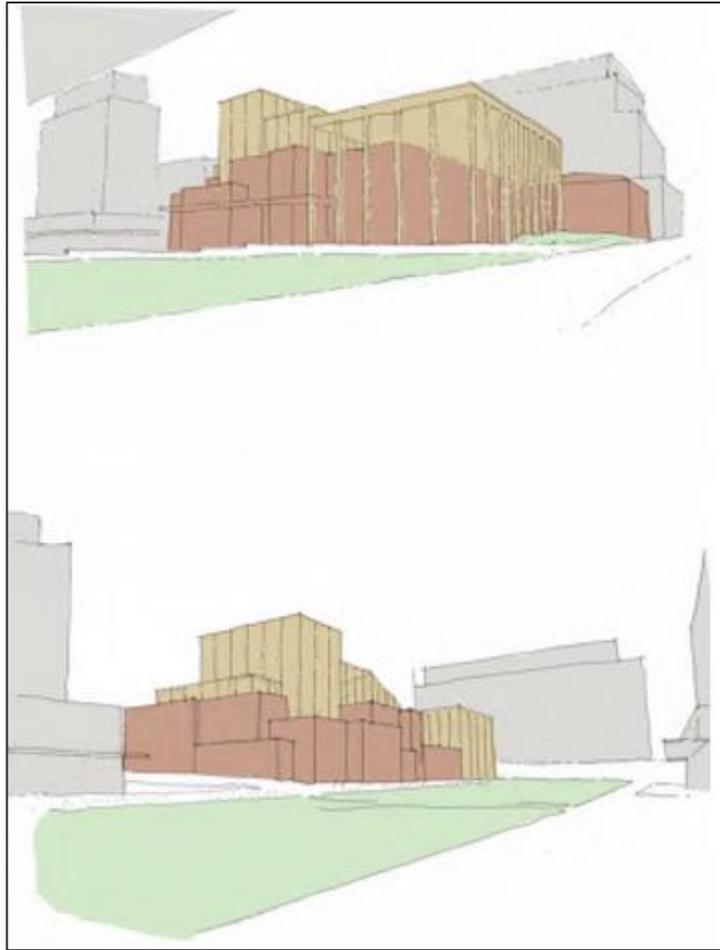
| Top image: View from Eton Street, Bottom image: View from Peace Park (Source: Applicant)
